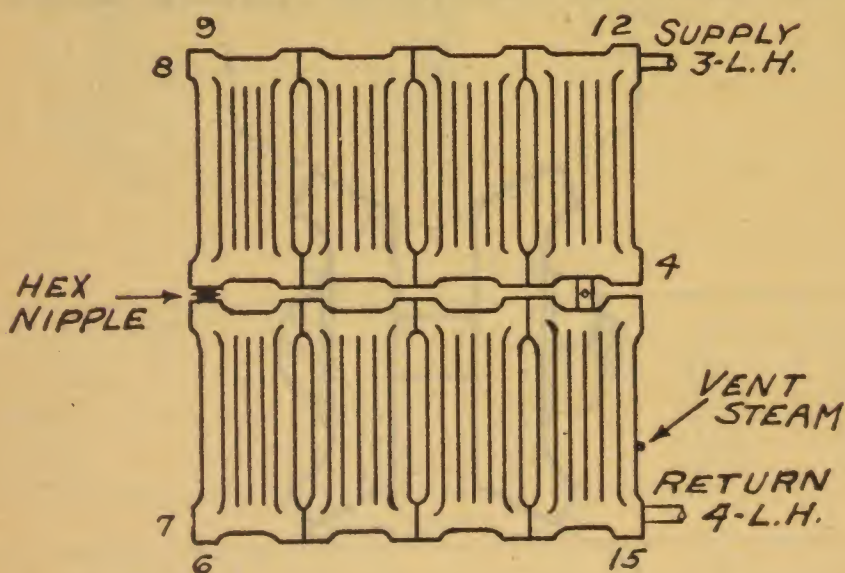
Assembled in eight sections in two tiers. For two pipe steam using adjustable spacing saddle.
